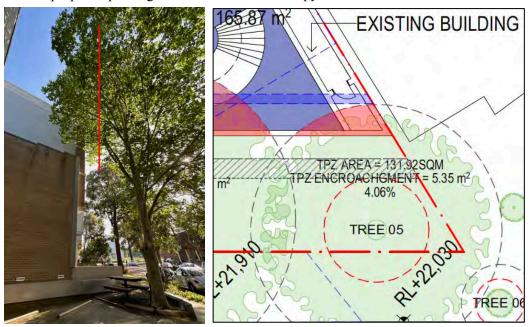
& 52: The proposed pruning requirements to accommodate the proposed building façade. (Source: Austin 2nd November 2023).
